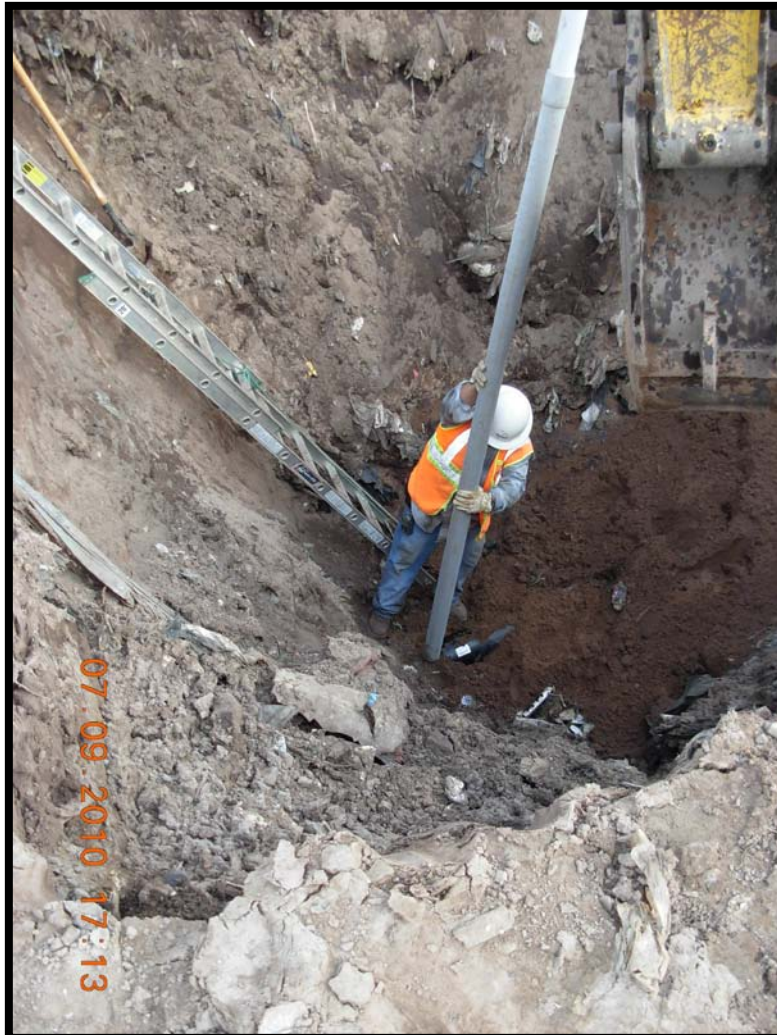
Sanding trench for lateral to extraction well GW-45.
